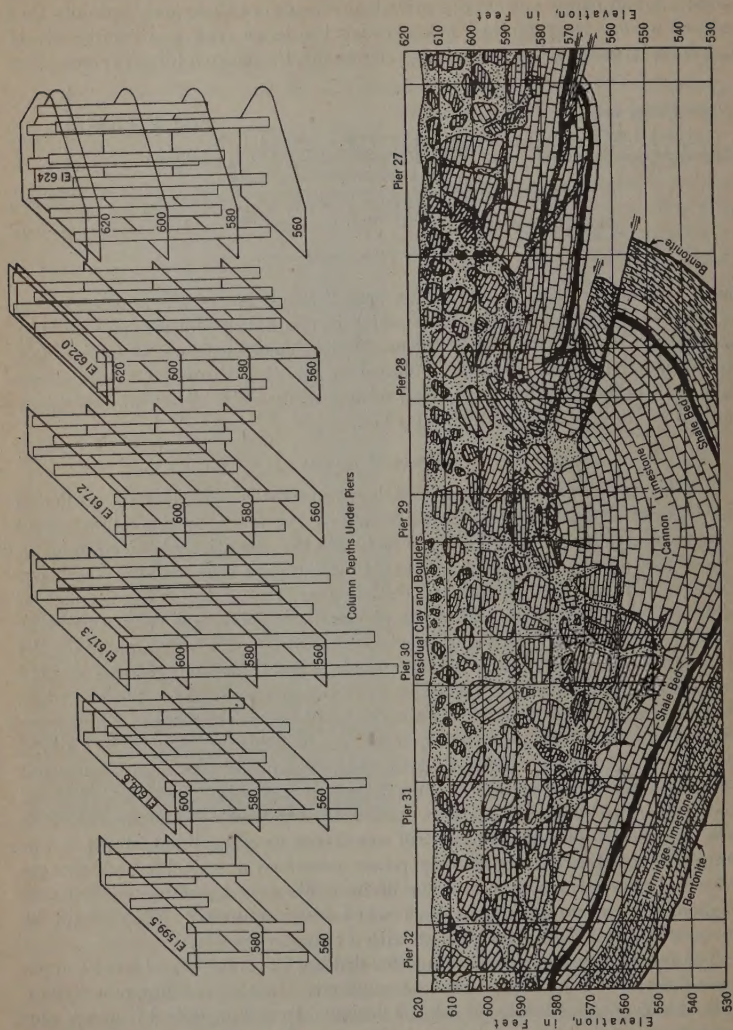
GENERALIZED GEOLOGIC SECTION UNDER UPPER GUARD WALL
